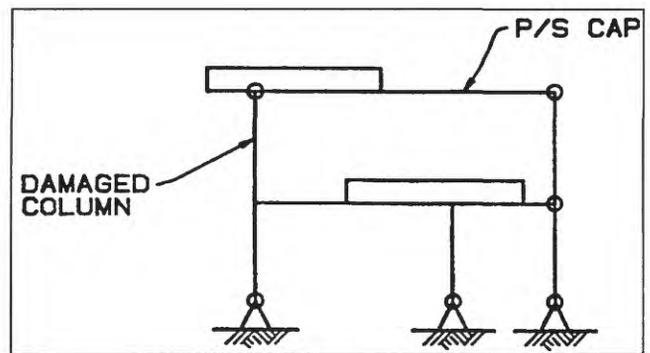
Schematic drawing of Bent 48 frame at Southern Freeway Viaduct.
